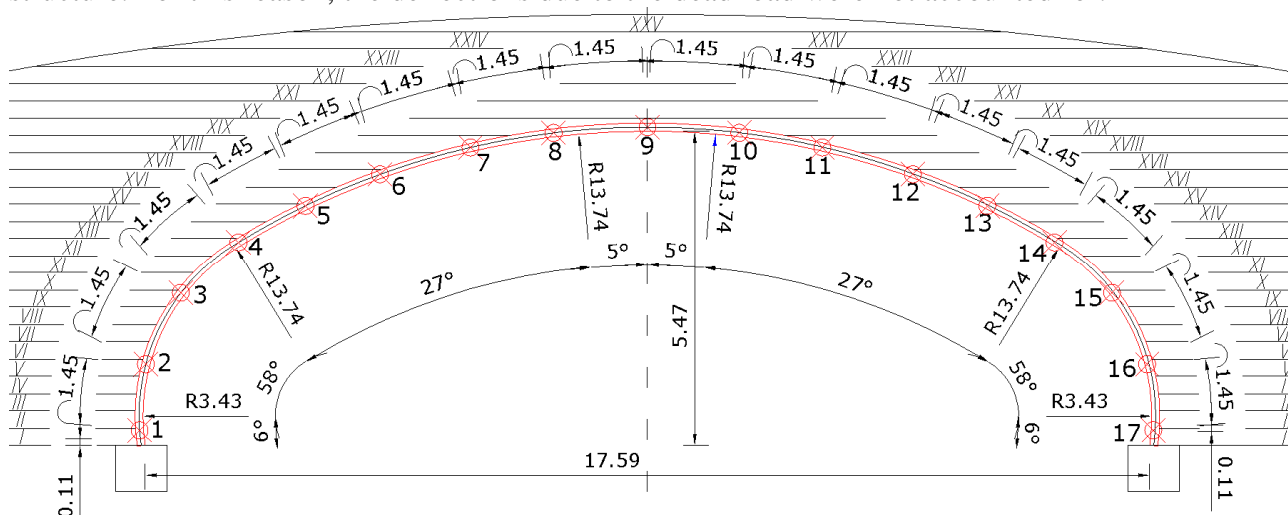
Basic dimensions of the structure, details of backfill layers and location of geodetic measurement points.
